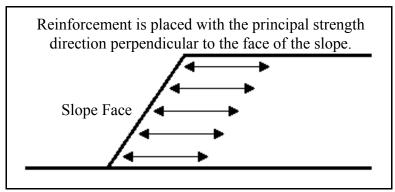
Placement of Geosynthetic Reinforcement for Steep Slope Construction.
